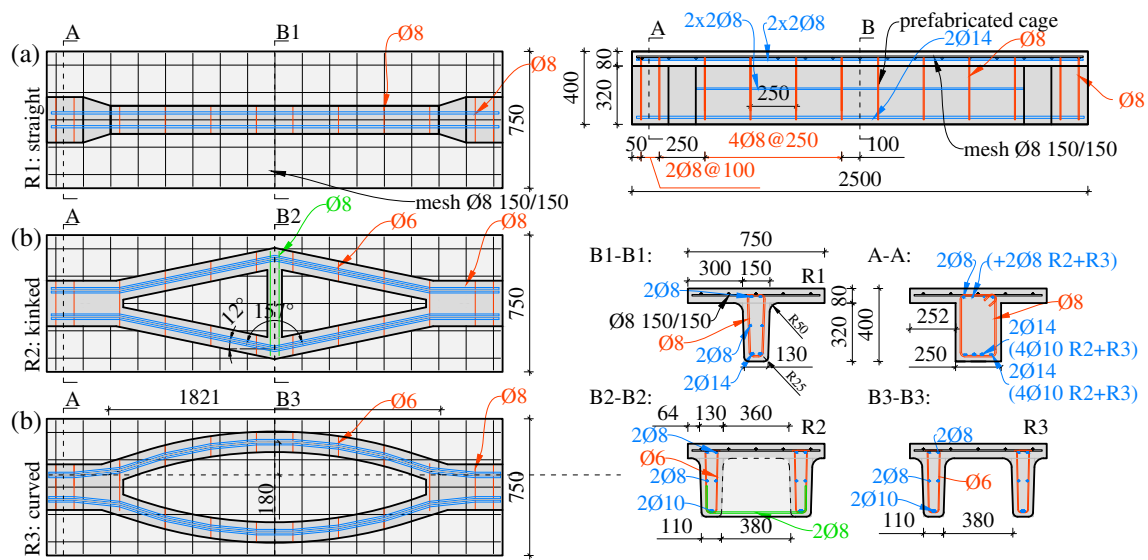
Reinforcement layout of the rib specimens: (a) R1 straight rib; (b) R2: kinked rib with a diaphragm; and (c) R3: curved rib.
